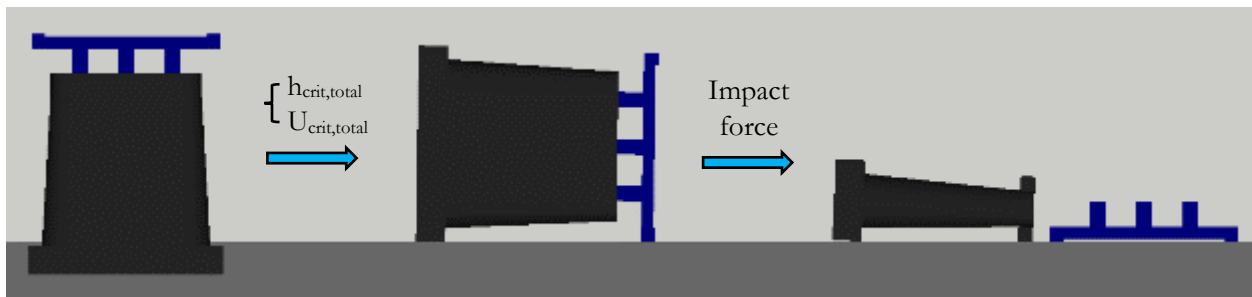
simultaneous failure of the bridge deck and pier (hypothesis 2)
